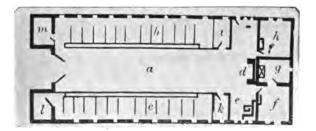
Ground-plan of Fig. 27, showing the combination of ox-house and fire-house or hall.
